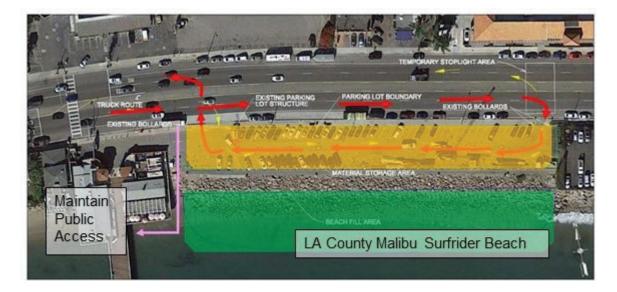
Malibu Pier Parking Lot and Shoreline Placement Site
